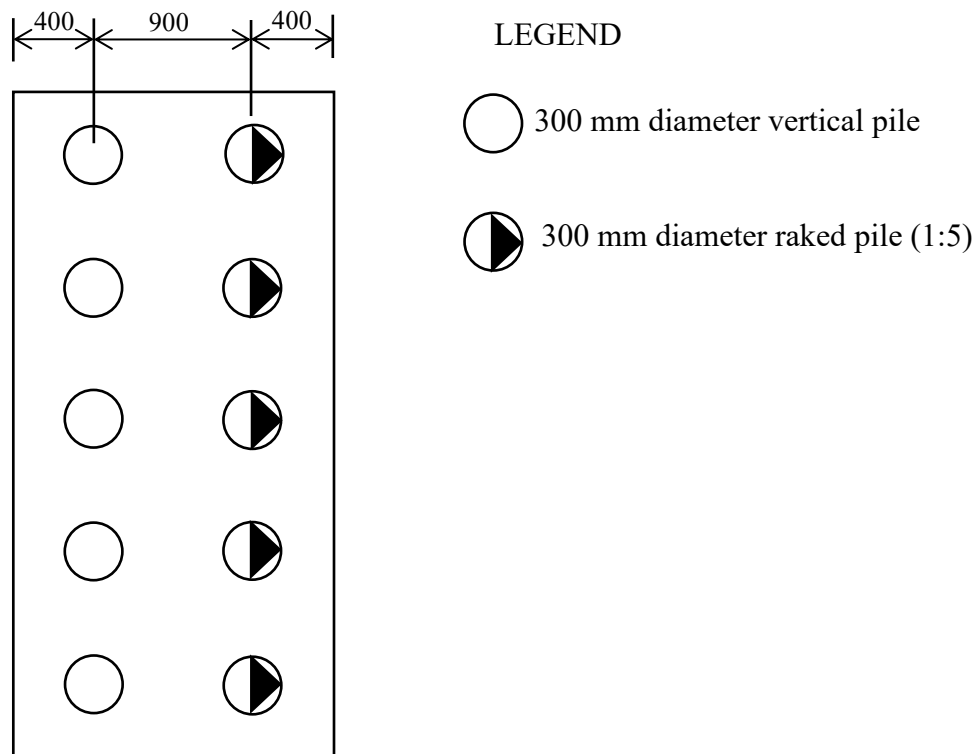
Pile arrangement for a bridge abutment (all dimensions in mm)
